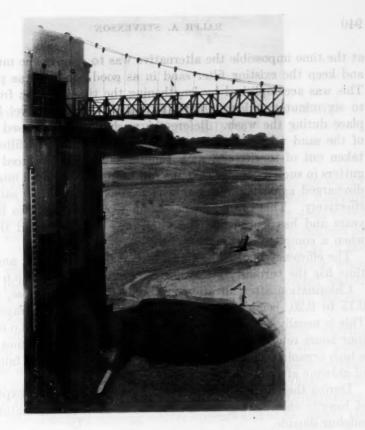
Intake Pier Showing Low and High Water Conditions 939
